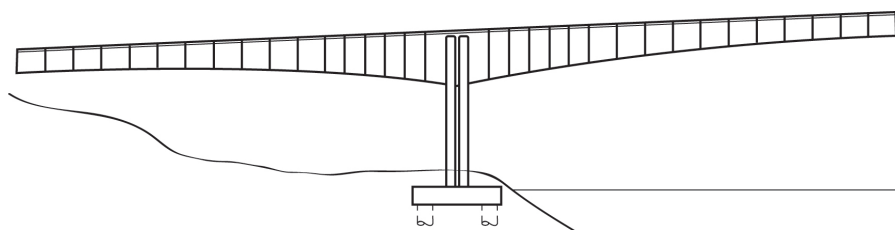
Balanced cantilever construction prior to stitching to adjacent deck sections
